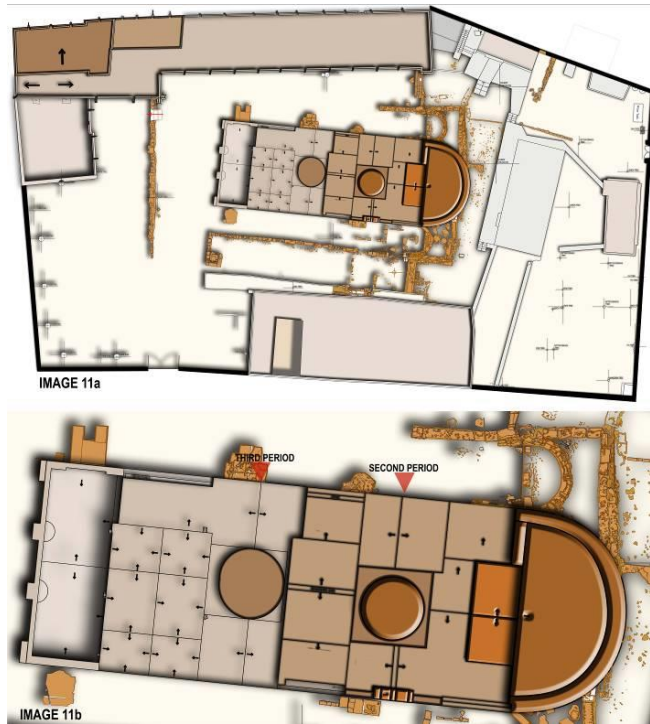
(a) Survey drawing of the site, roof plan (b) survey drawing of the church building, roof plan
